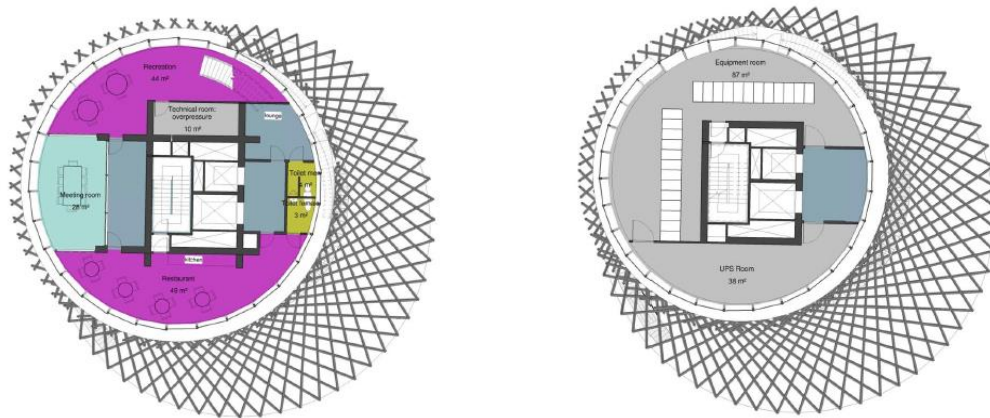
& 4.13: Examples of junction floors, sections Taiwan ATC tower [Royal HaskoningDHV, 2014]
